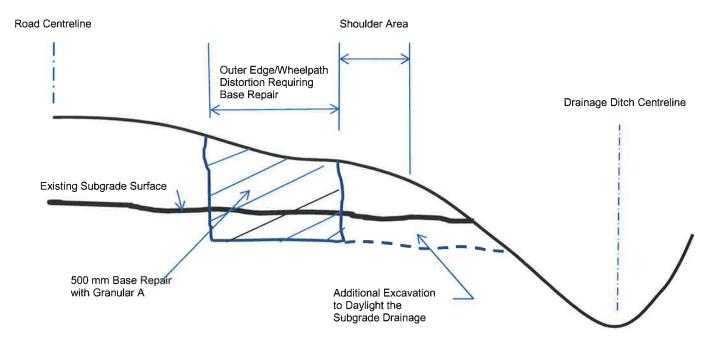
HALF ROAD SECTION SHOWING BASE REPAIR TREATMENT (NTS)
